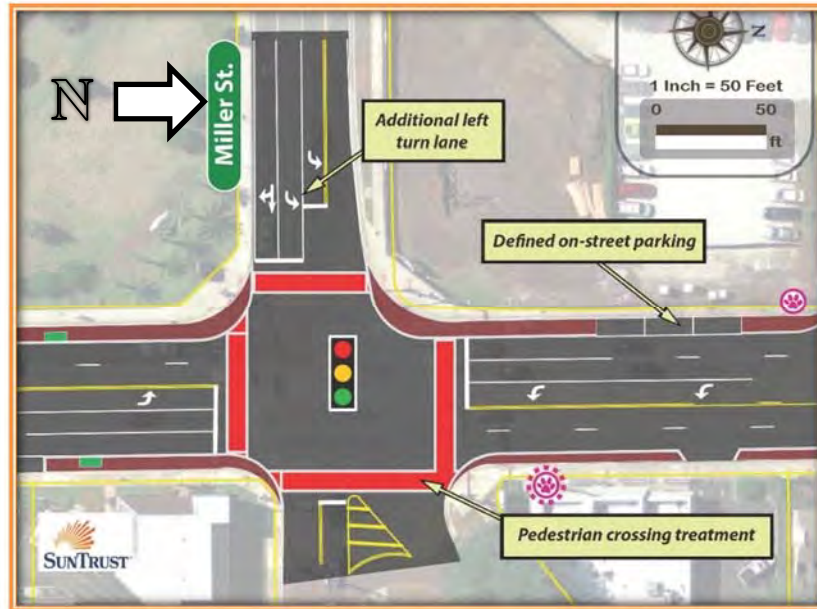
Recommended Alternative: Orange Avenue/Miller Street Intersection
